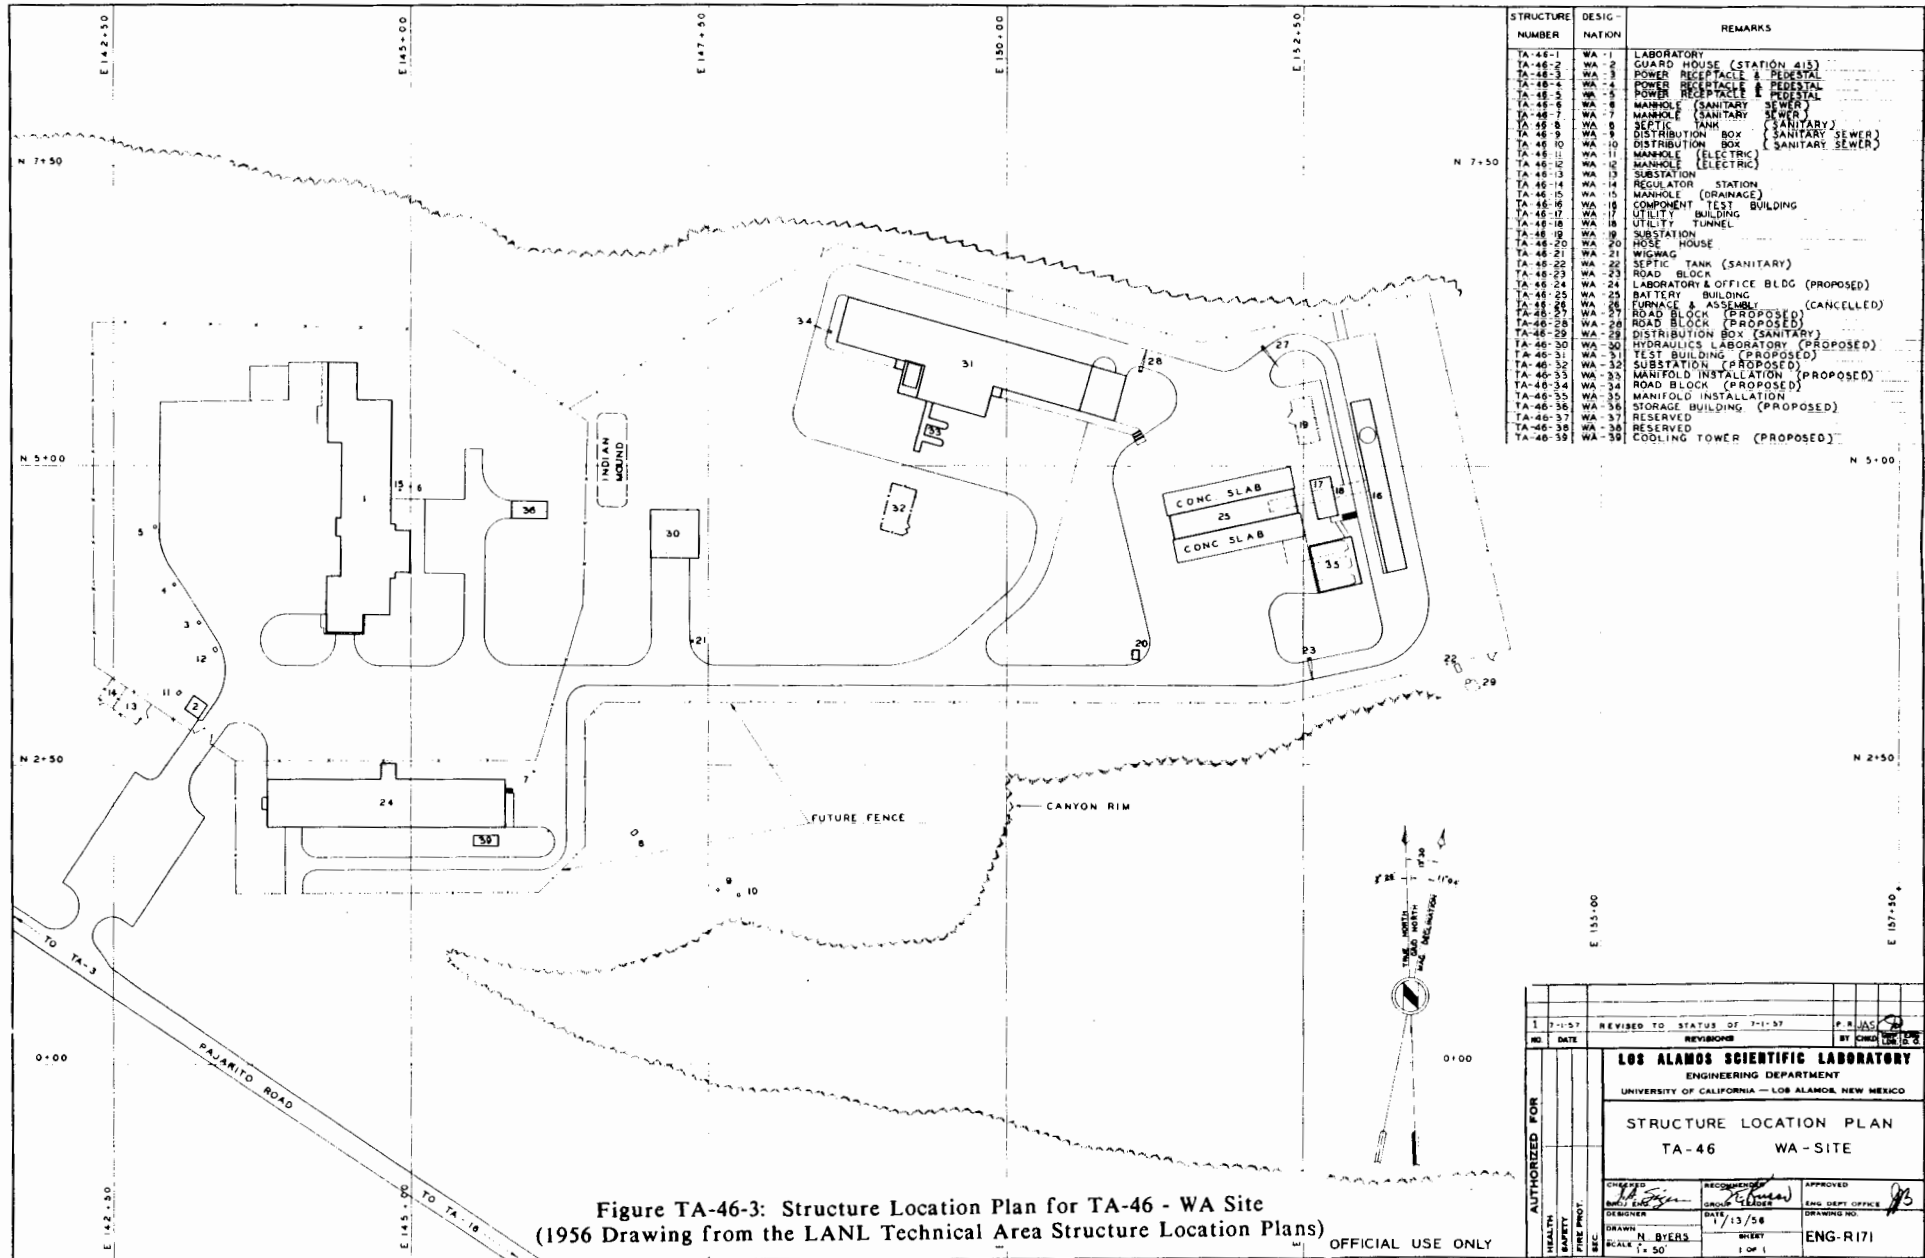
Structure Location Plan for TA-46 - WA Site
